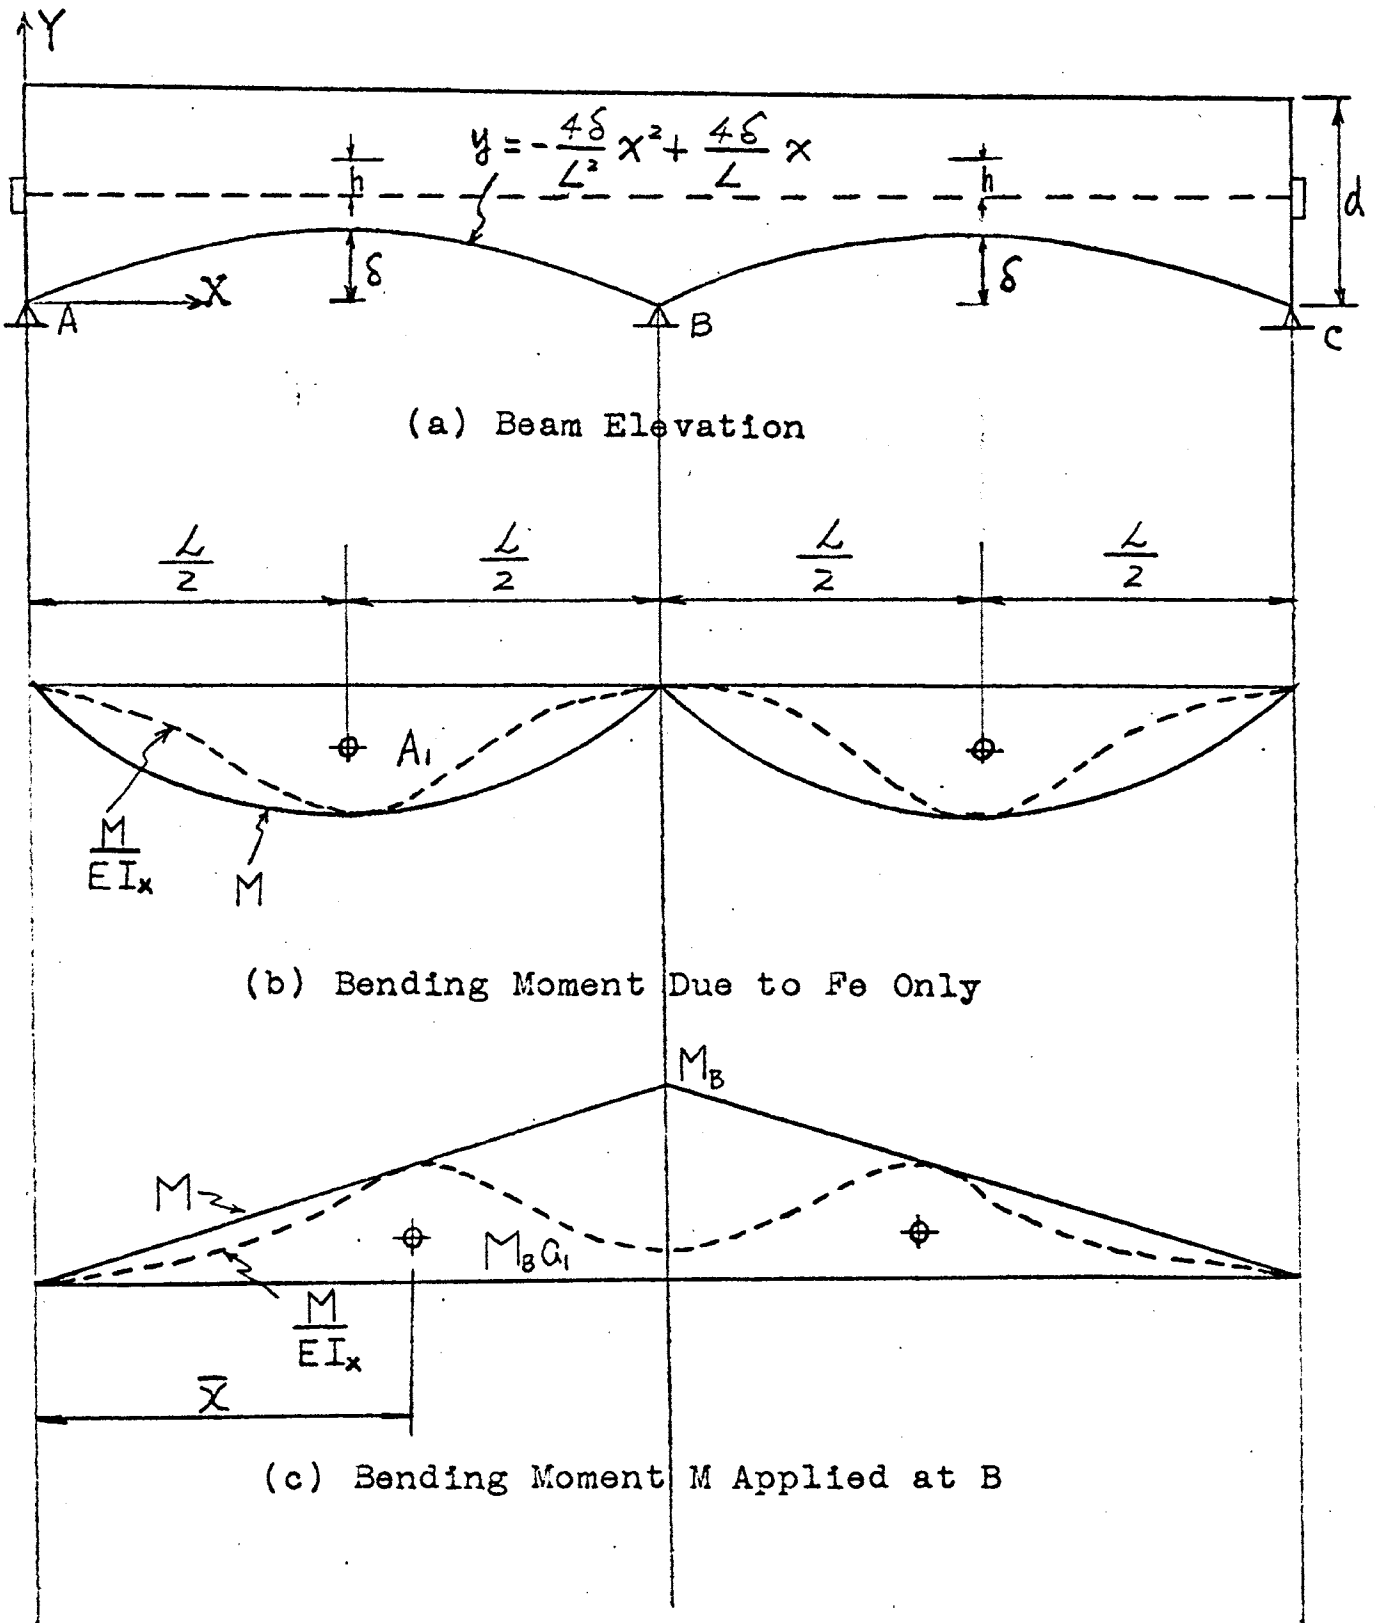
Continuous Prestressed Concrete Beam with Variable Section and Straight Prestressing Tendons.
